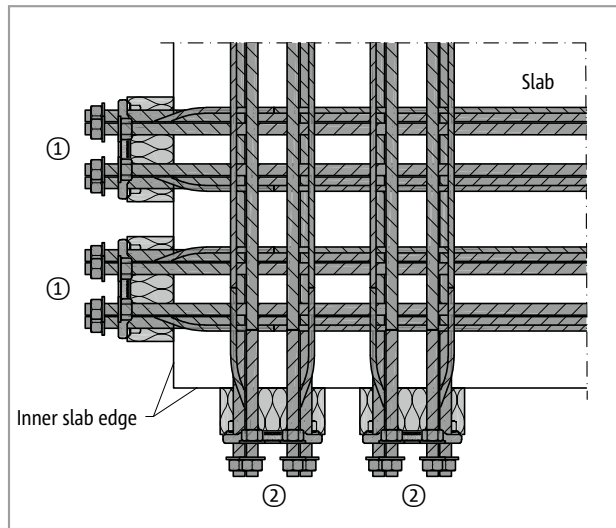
Schöck Isokorb® T type SK: Outer corner
